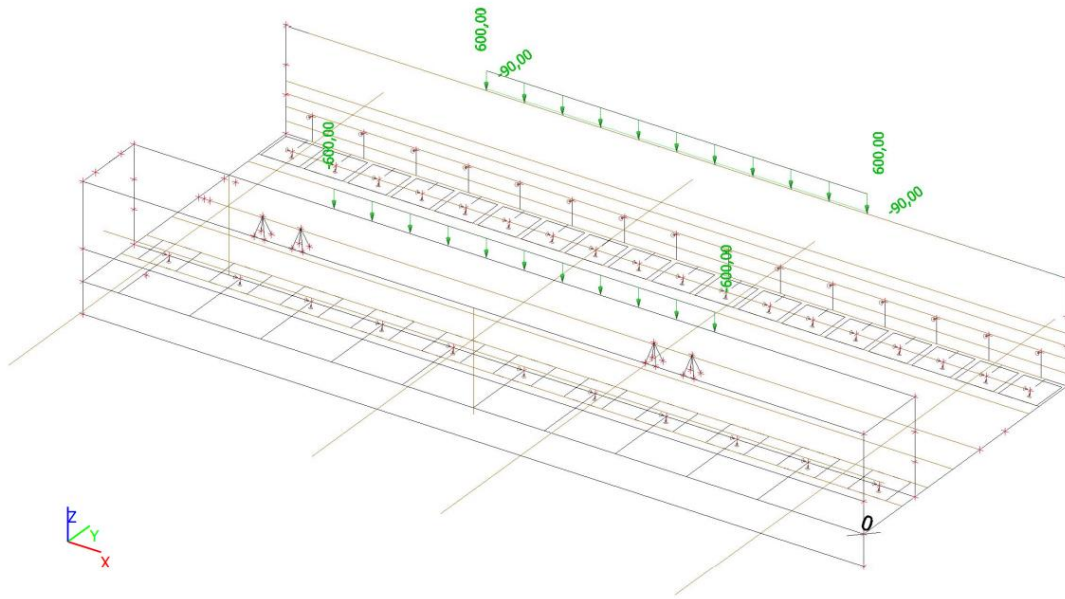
2.5D model: LC7-1- Crane load (ground side rail towards water)
